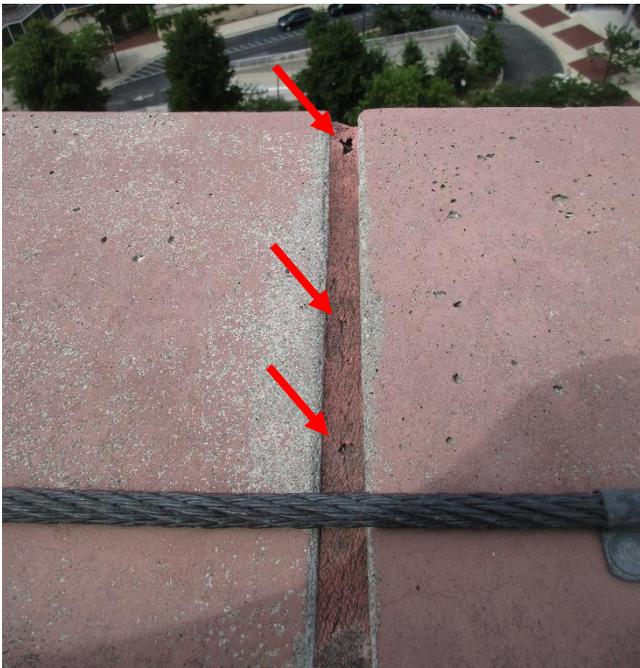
Sealant between the tops of facade panels at Column PH/P1. Note the alligator cracking pattern and local failures in the sealant indicated with red arrows.
